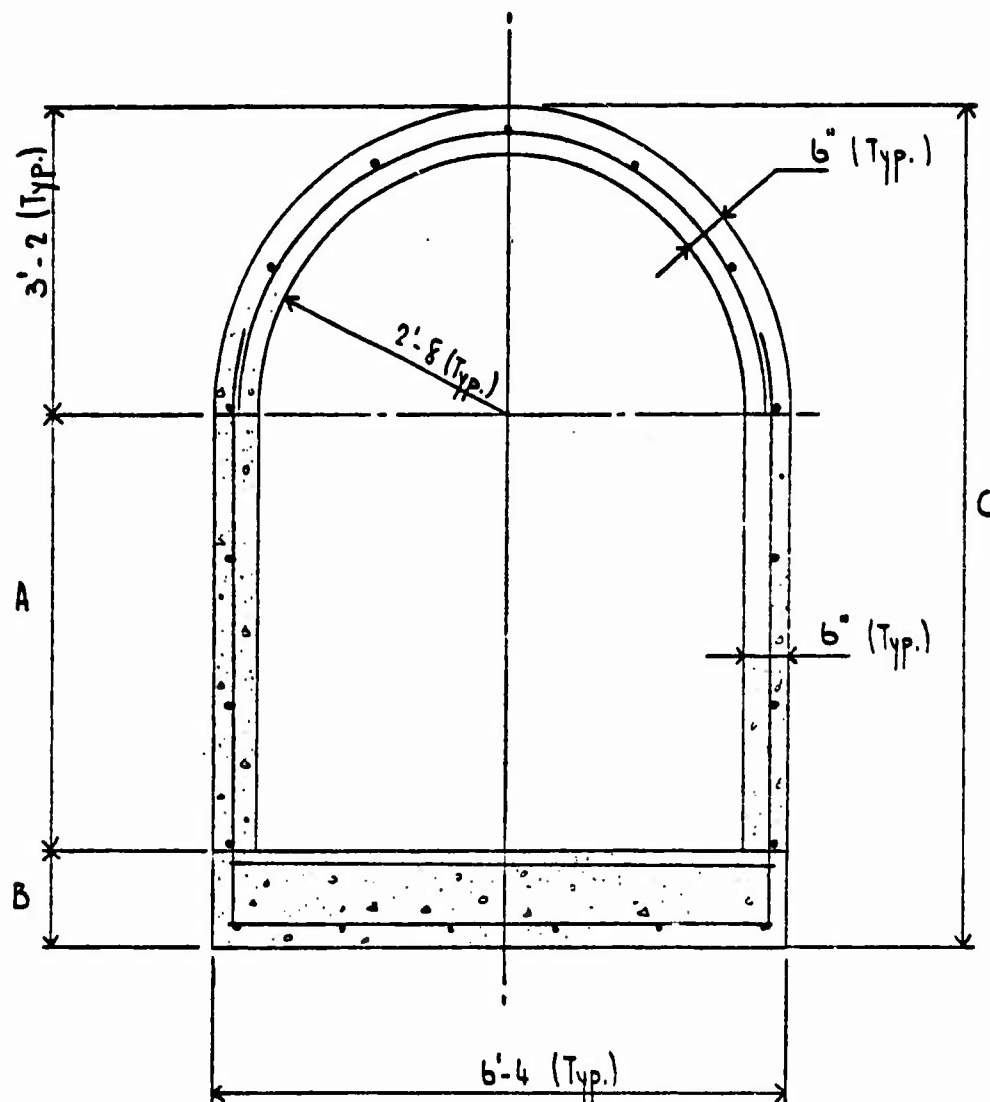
ENTRANCEWAY TUNNEL PLAN (100 AND 150 psi DESIGN SHELTERS)
